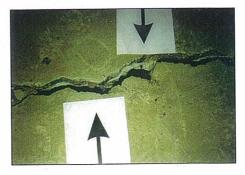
Localised cracking of the slab over a beam (upward arrow shows shear stud, downward arrow shows fracture of mesh)
